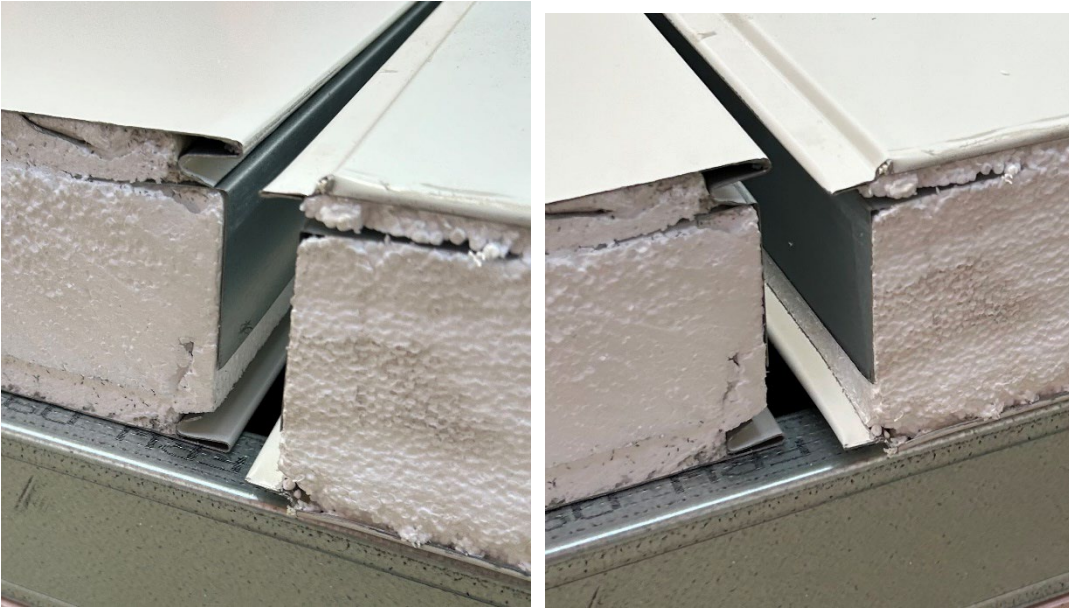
ISP-02 (EPS) sandwich panel joint profile with Steel “L” flashing installed to edge joints.
